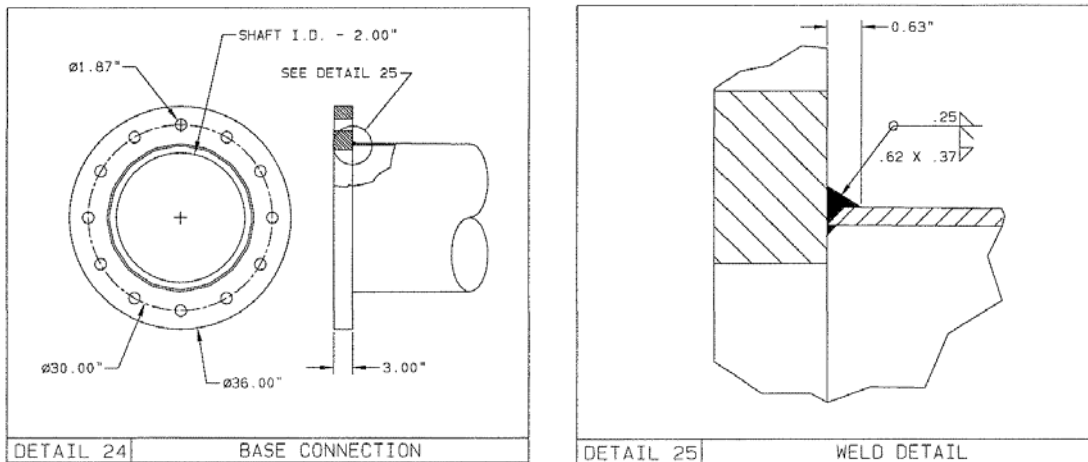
Example of full penetration weld connection (Courtesy of Valmont Industries)
